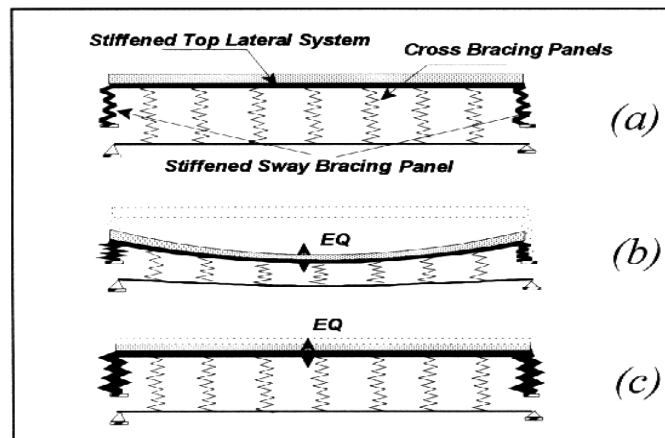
Conceptual 2-D model of deck truss and strengthening of top load path elements: (a) strengthening of end spring and top beam; (b) Large deformation imposed on interface springs; (c) Highly stiffened top beam and end springs
